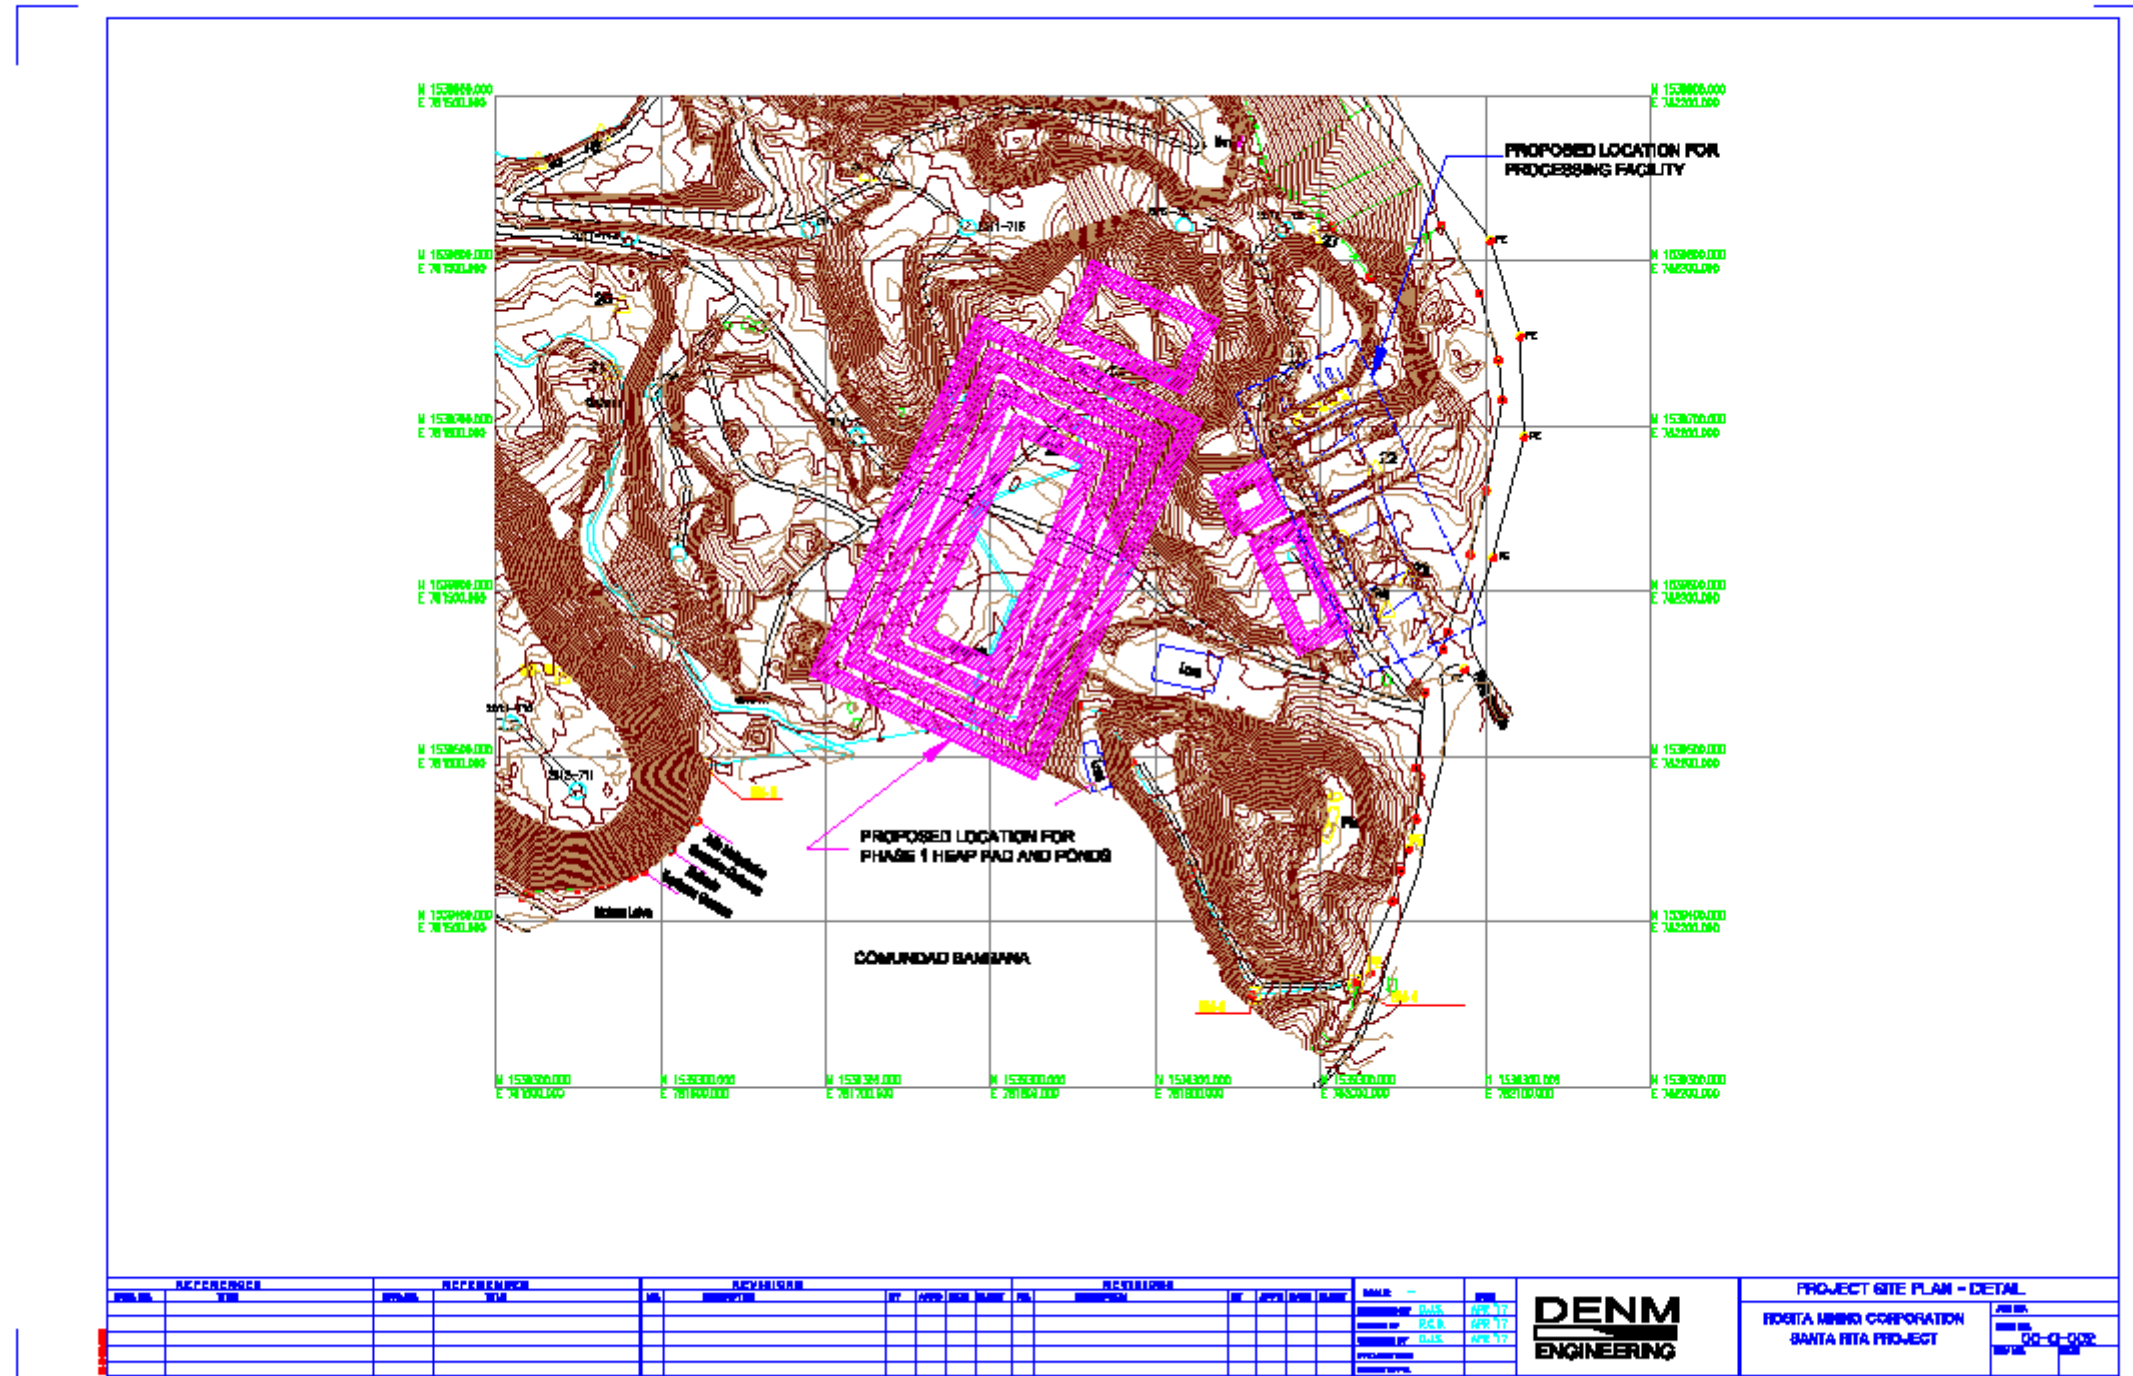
Project Site Plan – Detail (Source: DENM 2017)
